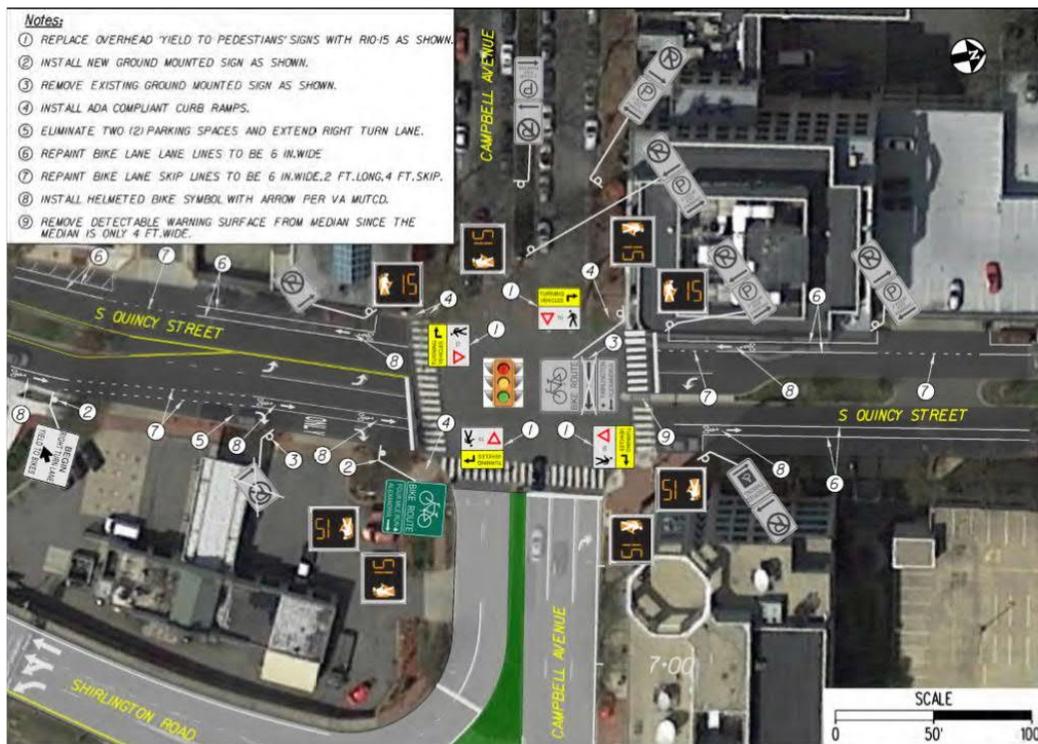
Multimodal Improvements at Campbell Avenue and South Quincy Street
